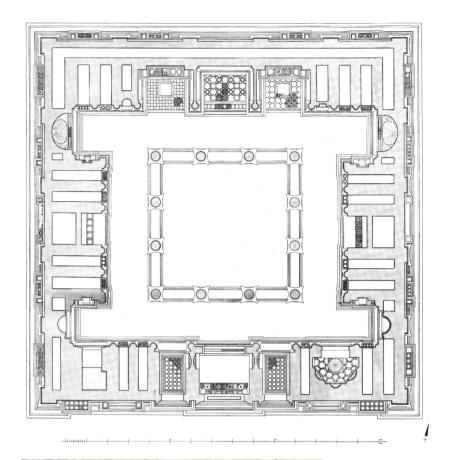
PALMYRA: TOMB NO. 36, RECONSTRUCTED GROUND PLAN.
